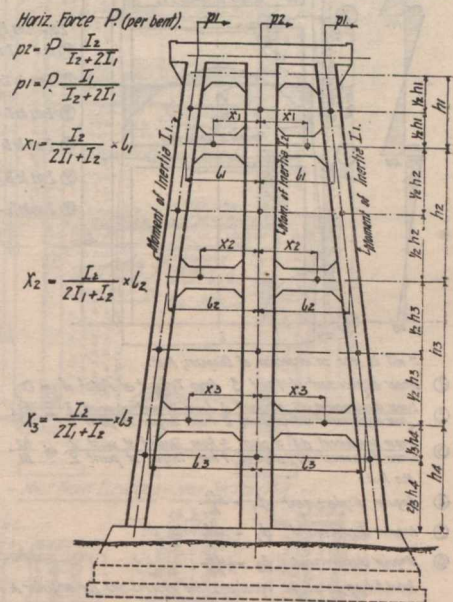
Bridges on North Toronto Subdivision, C.P.R. Dimensions of towers.
